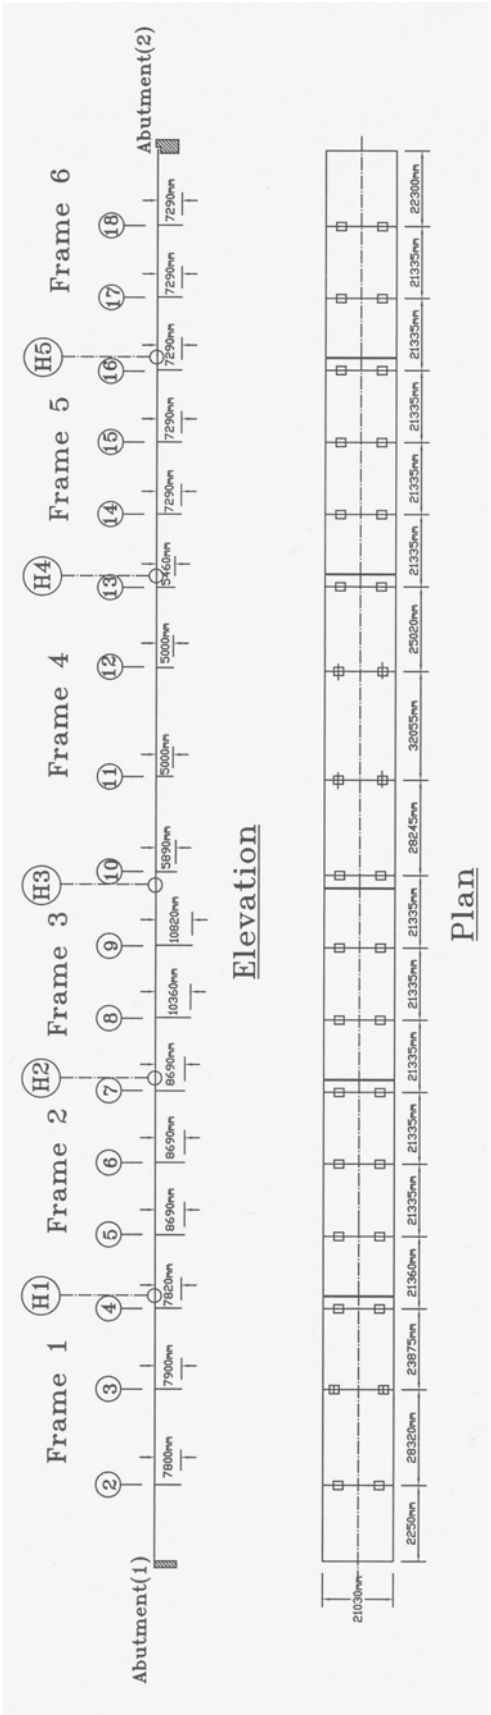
General Layout and cross section of the right College Avenue Undercrossing Bridge after modifying the column heights of Frames 1, 3, and 4
